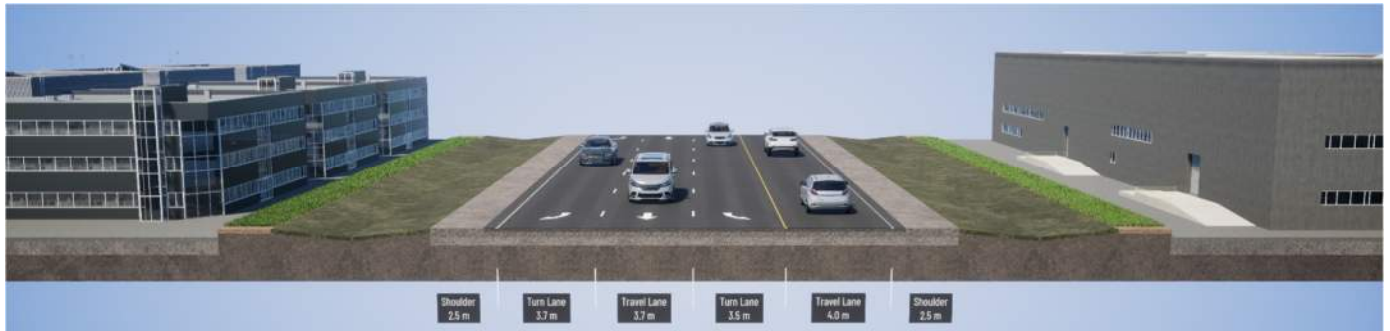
Figure 7-6 illustrates the proposed typical road cross-sections for the roads in the Preferred Plan. Paula Court will be reviewed further in Detail Design for potential updates to an urban cross section (i.e. including sidewalk/pedestrian access to Dufferin County Road 23).
